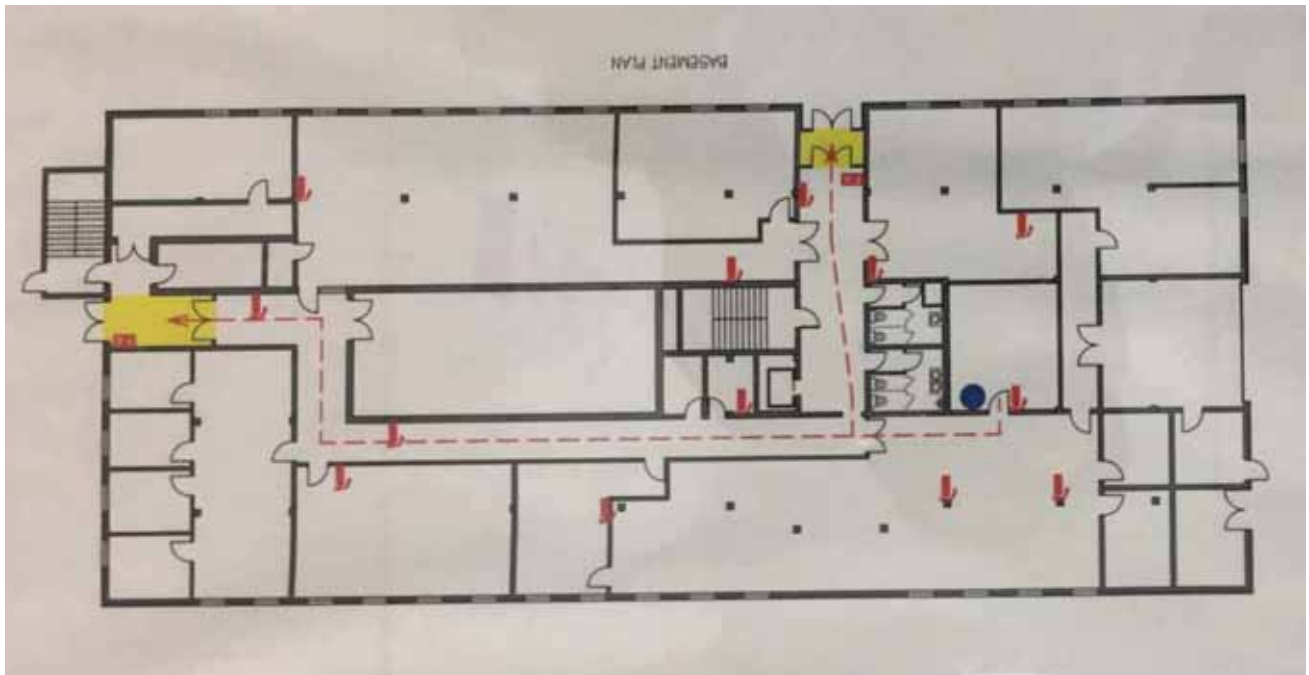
Basement (walk-out) floor plan from building-posted egress map (N.T.S.)
